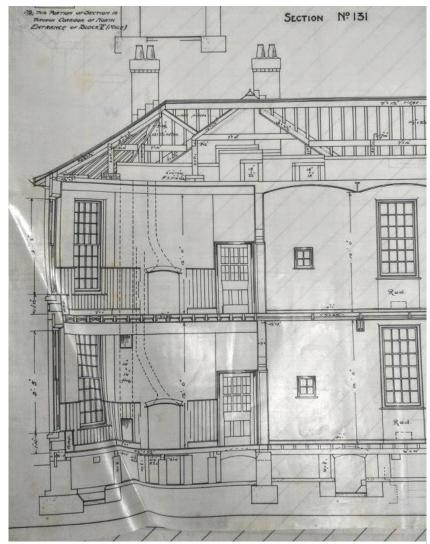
Elevation view of the wards with details of the chimney flues and plenum ventilation system (Oatley and Skinner, 1902)
